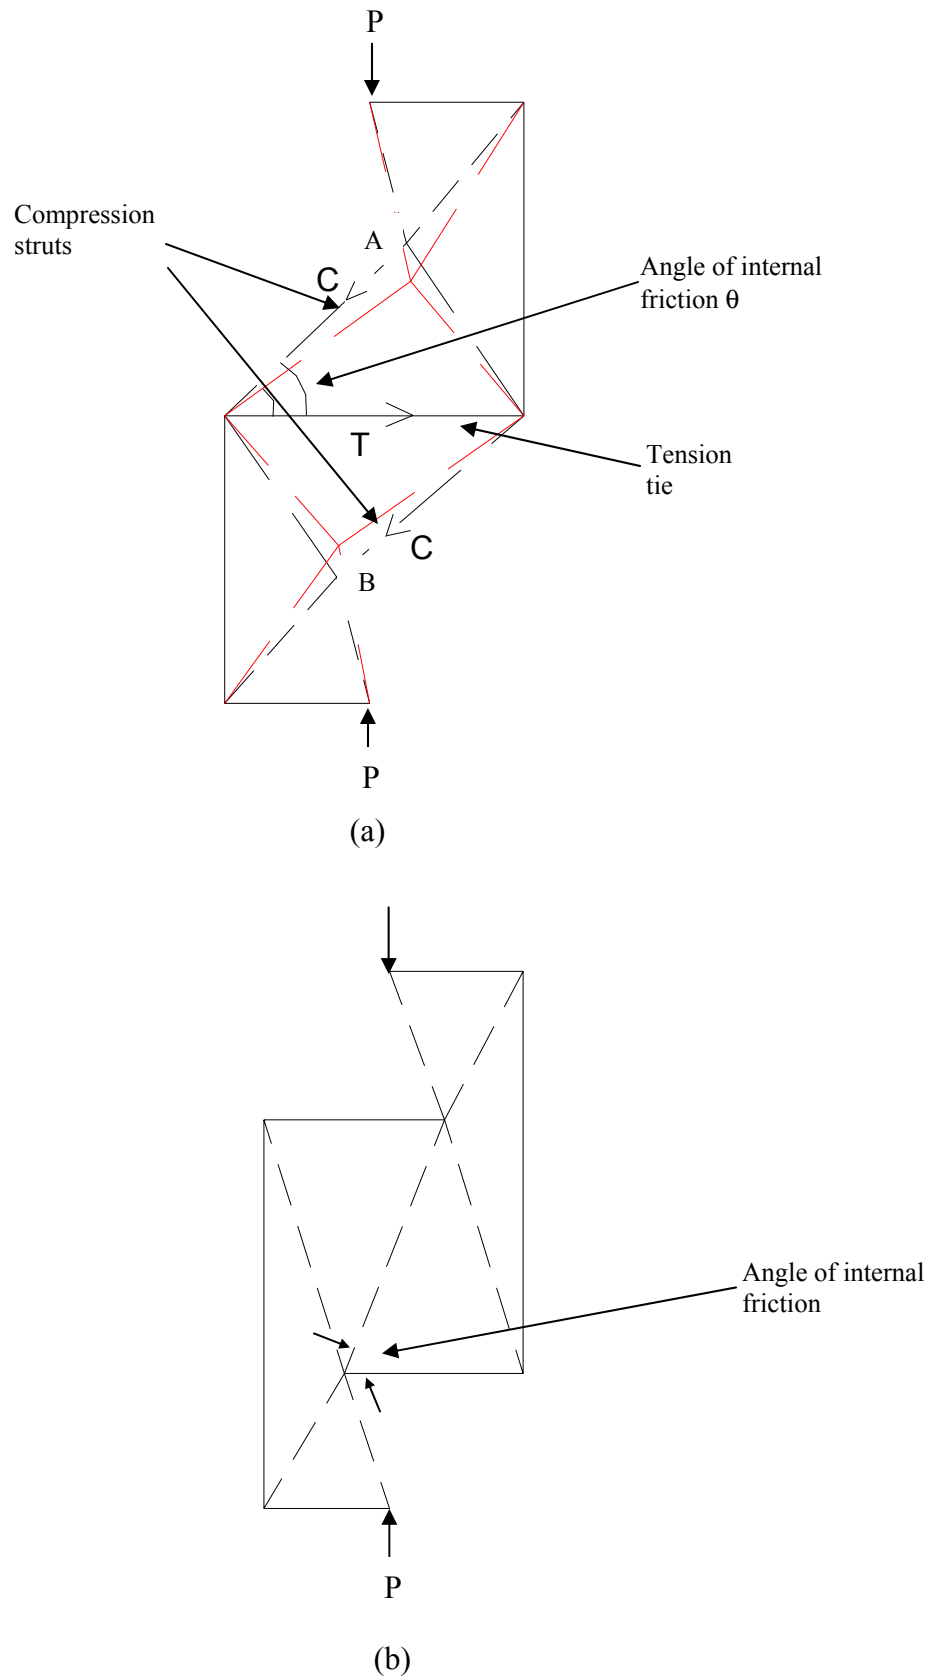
Possible Strut-and-Tie Modeling of push-off specimens
